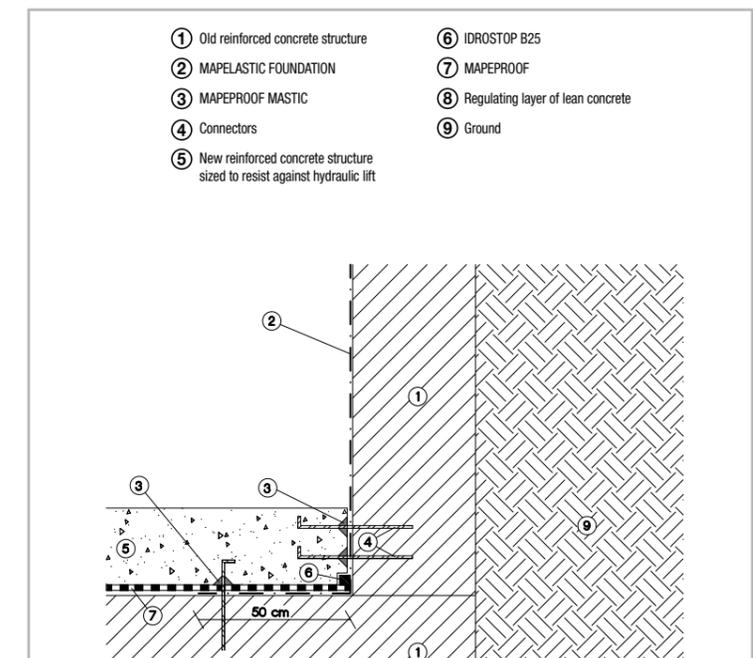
Detailed layout of relining the inside of a room by applying MAPEPROOF on the horizontal surfaces and MAPELASTIC FOUNDATION on the vertical surfaces: fillet joint between the floor slab and retaining wall
